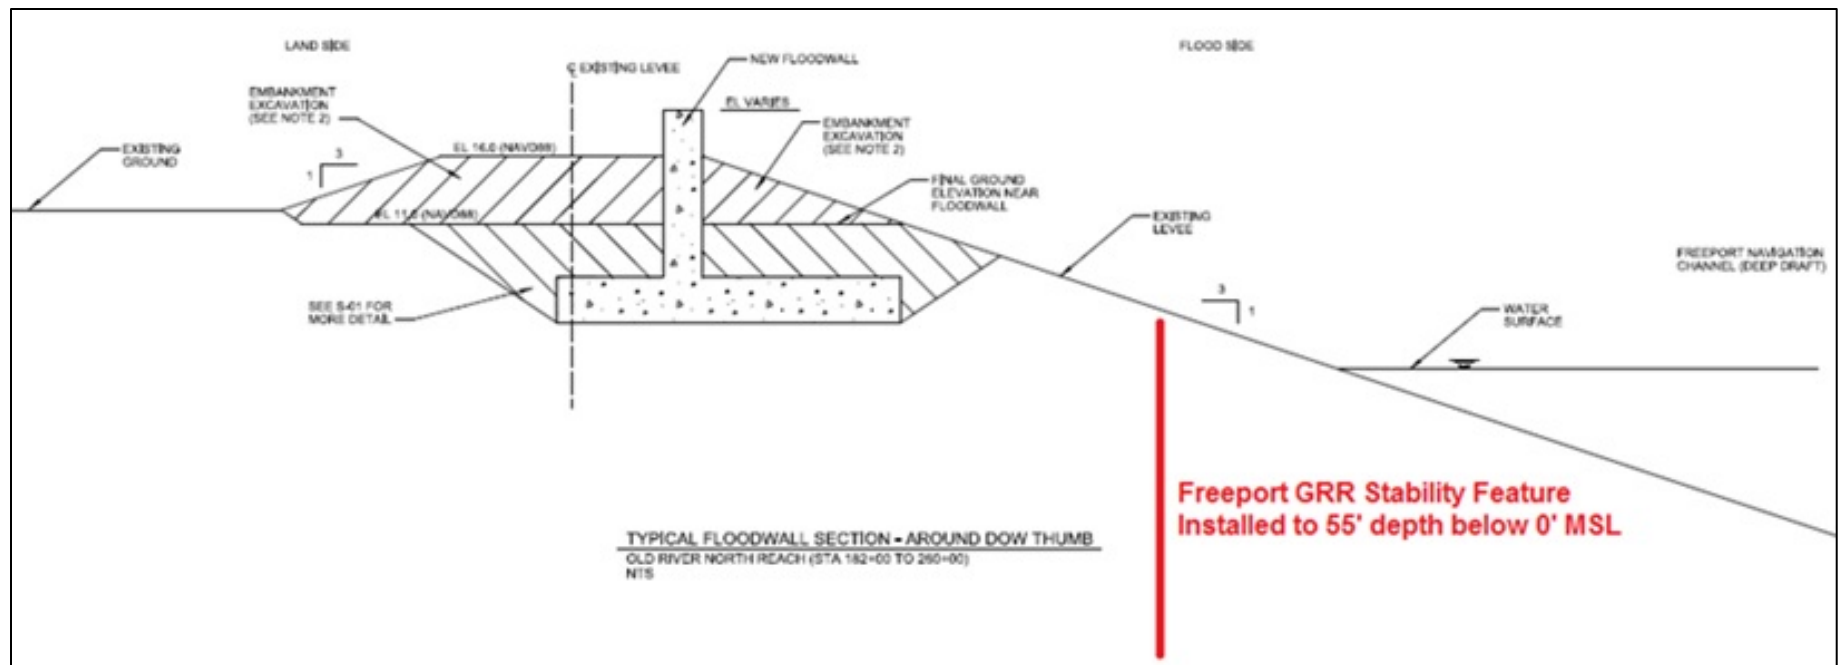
S2G Typical Floodwall Section and Freeport GRR Proposed Modifications for TSP
